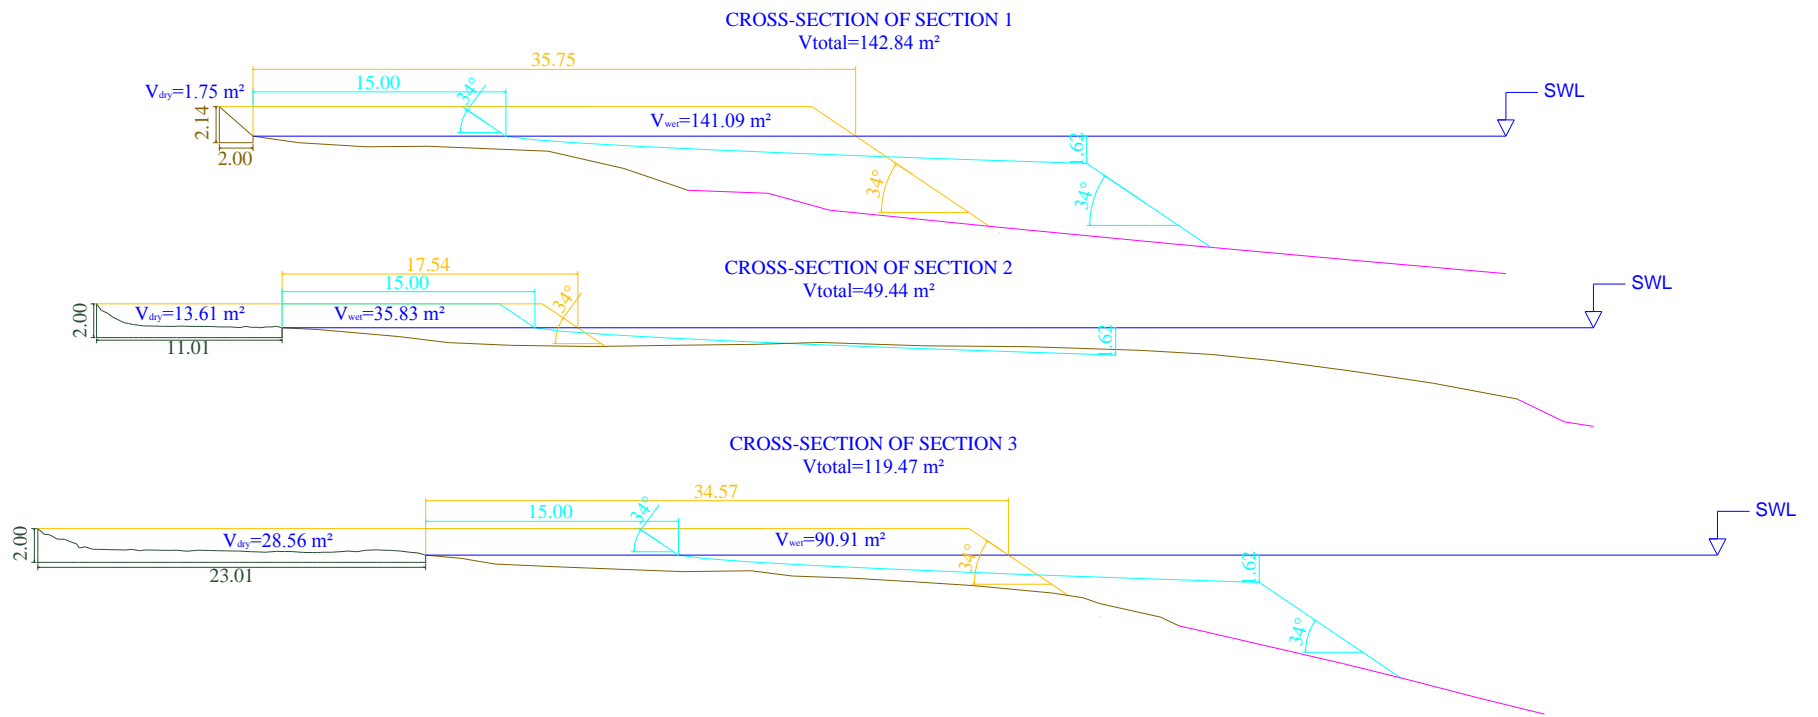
Design profiles of Section 1,2 and 3 for 15 m new dry beach width ($D_{\text{fill}}=0.45 \text{ mm}$).
